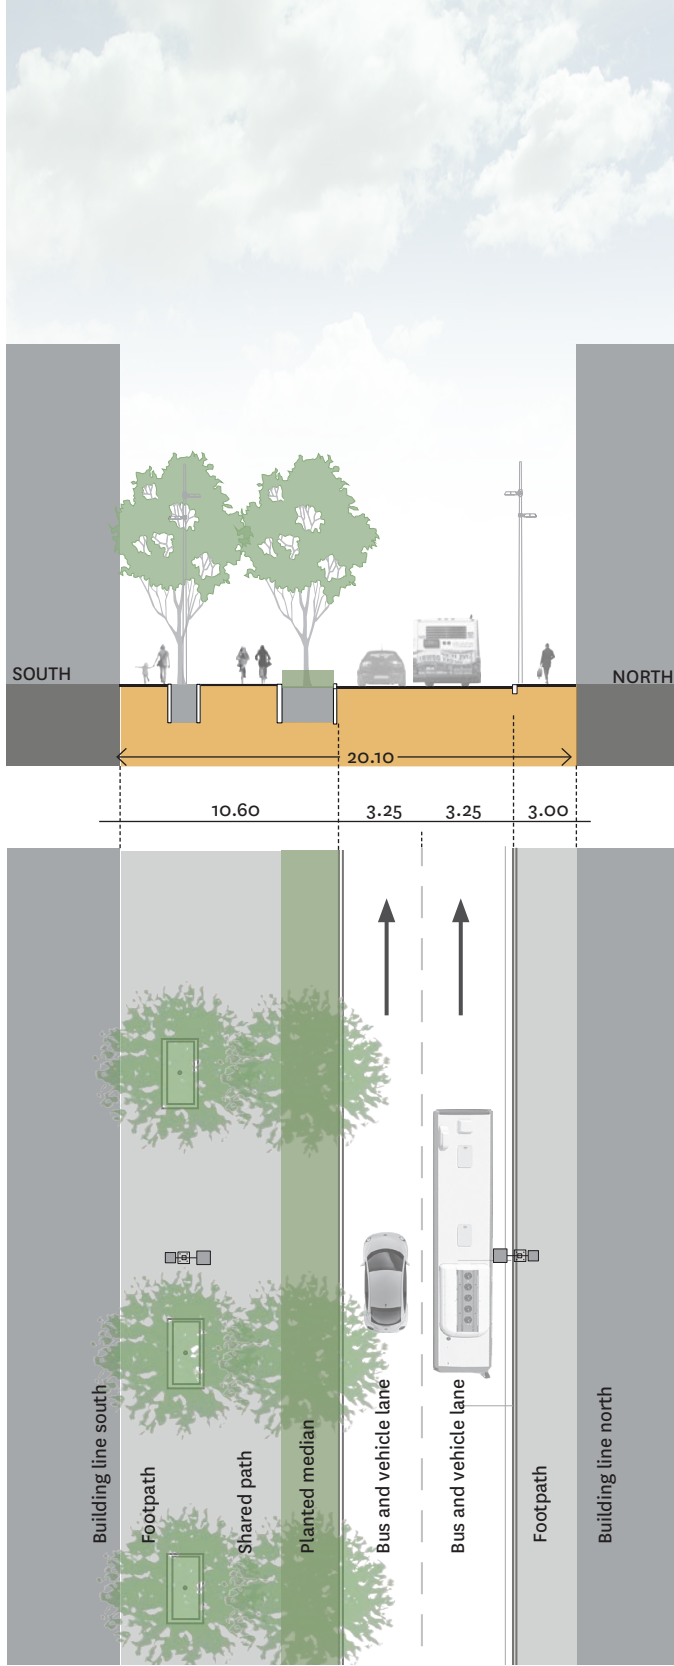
C2 – St Asaph Street at Metro Sports Facility
